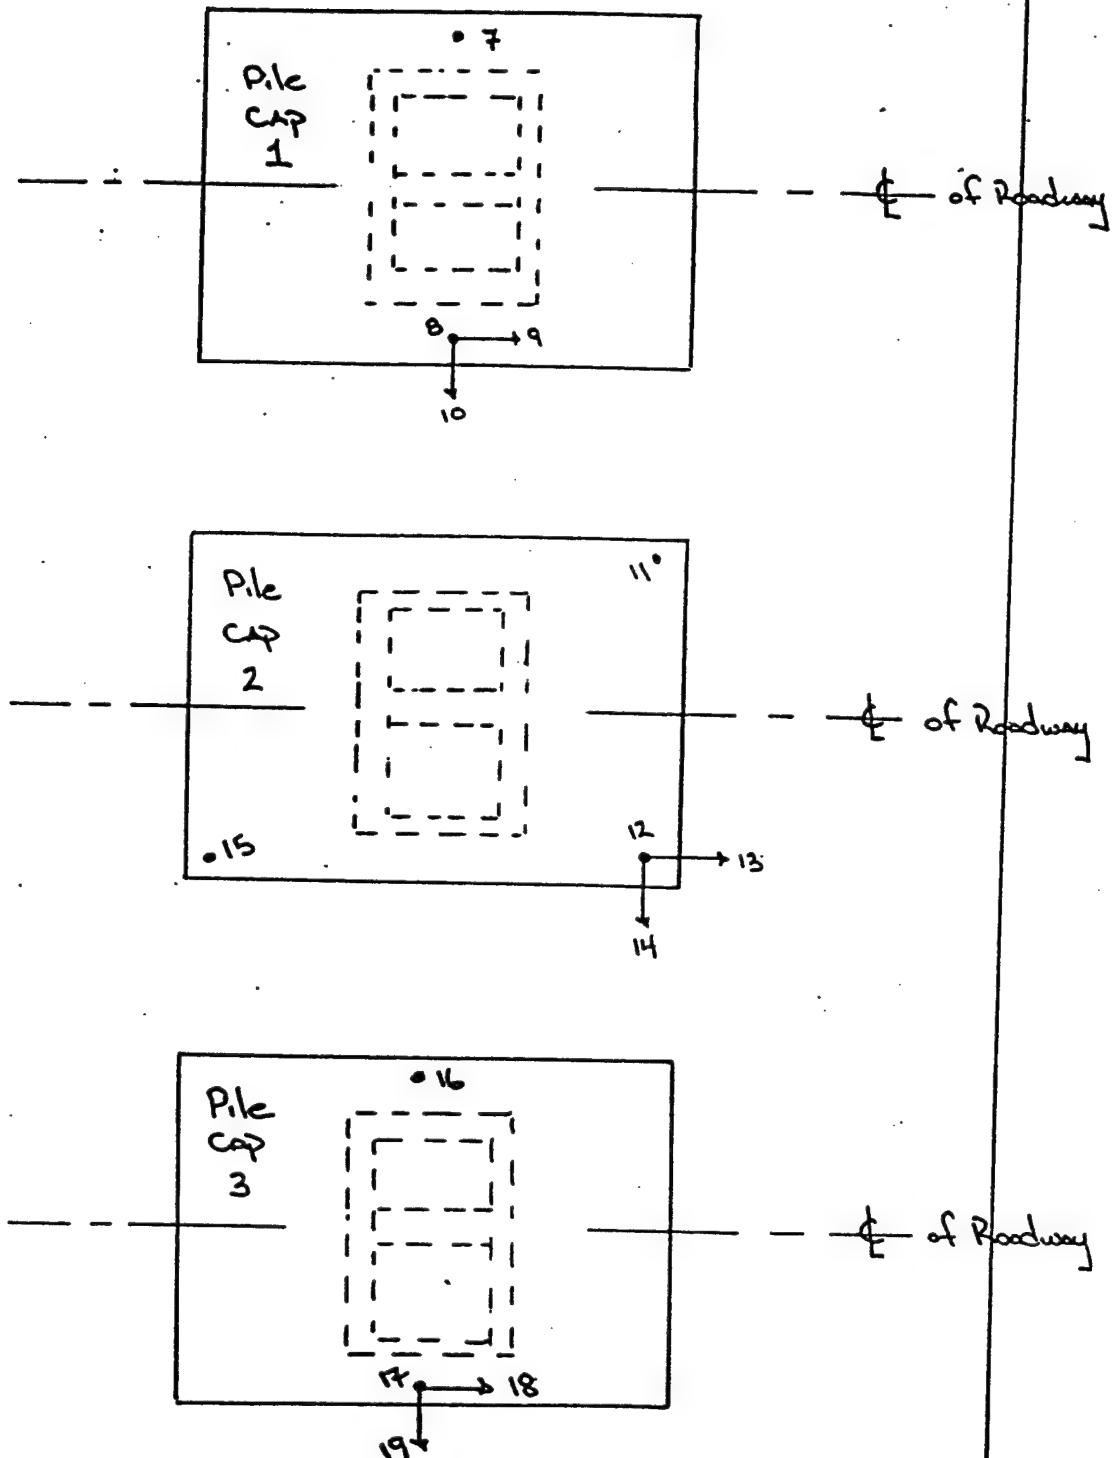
Keaiakaha Bridge Seismic Instrument Locations (Plan View).
